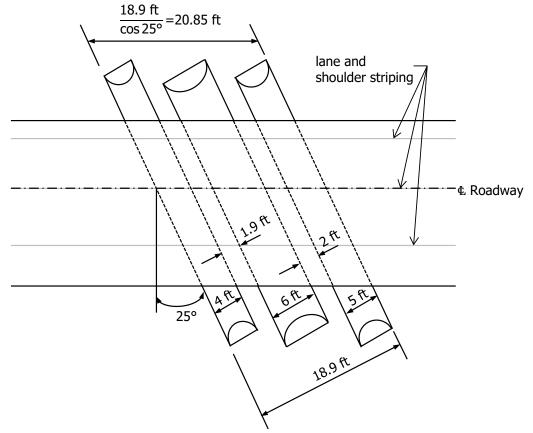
Plan view of a skewed, multi-pipe culvert under fill.
